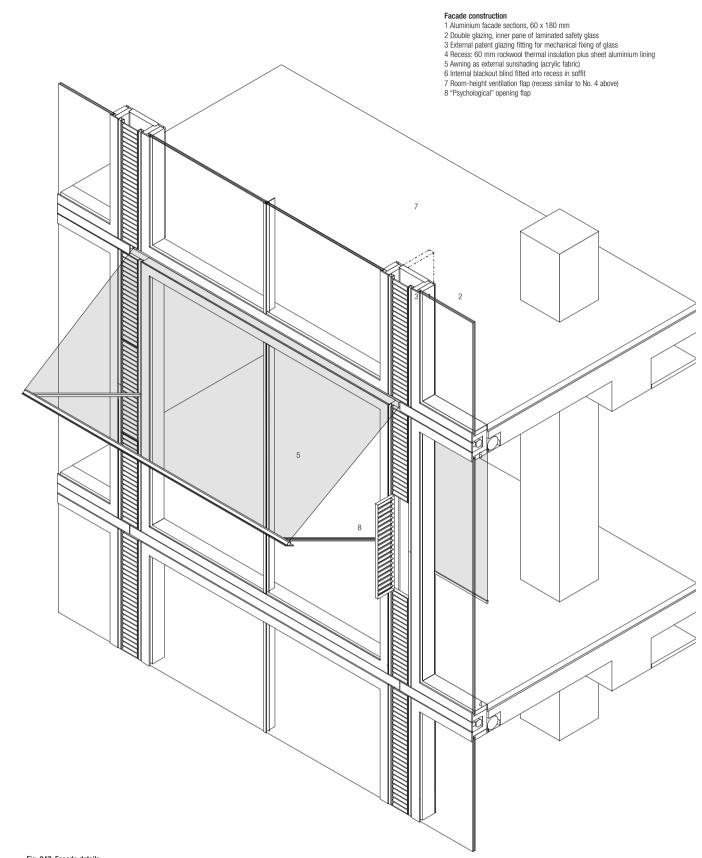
Facade details Spaces between window frames for ventilation (vertical) and sunshading (horizontal)
